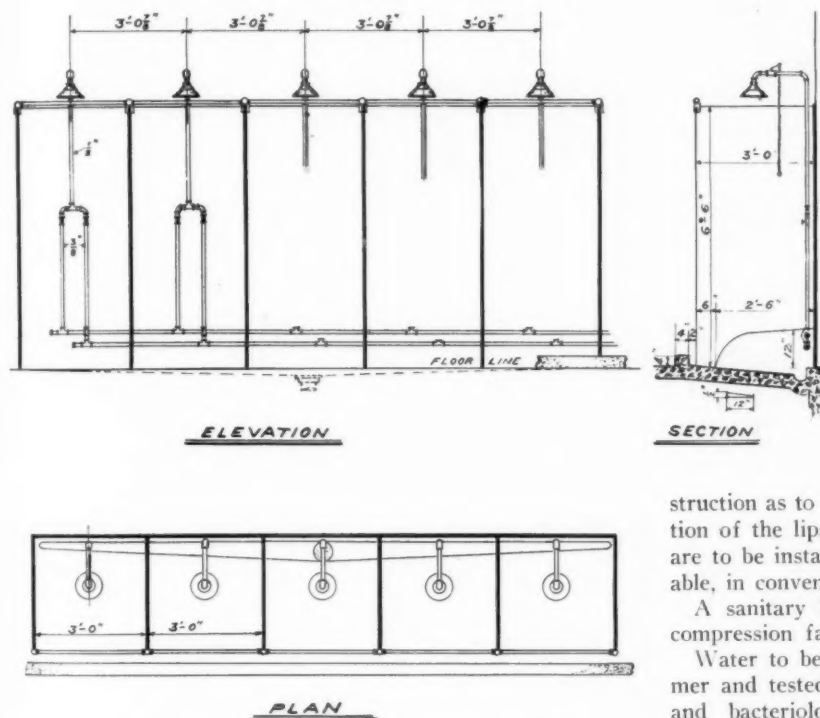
The showers in plan, elevation and section, showing stalls and special floor construction.
